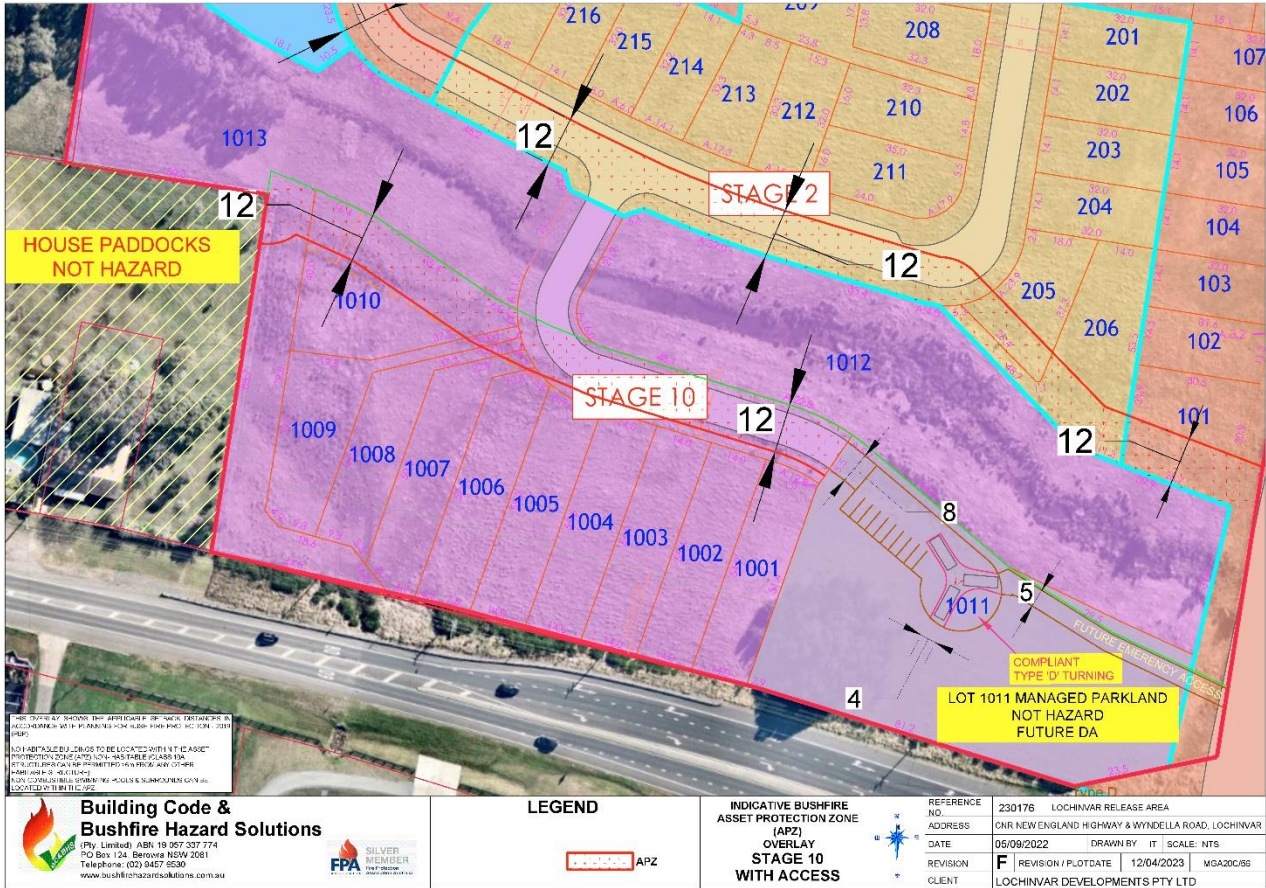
Overlay showing the proposed emergency access within the proposed parkland.
